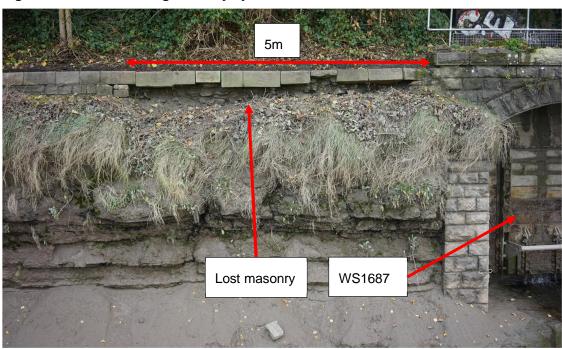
NCS13 Missing masonry by Sheene Road Culvert
